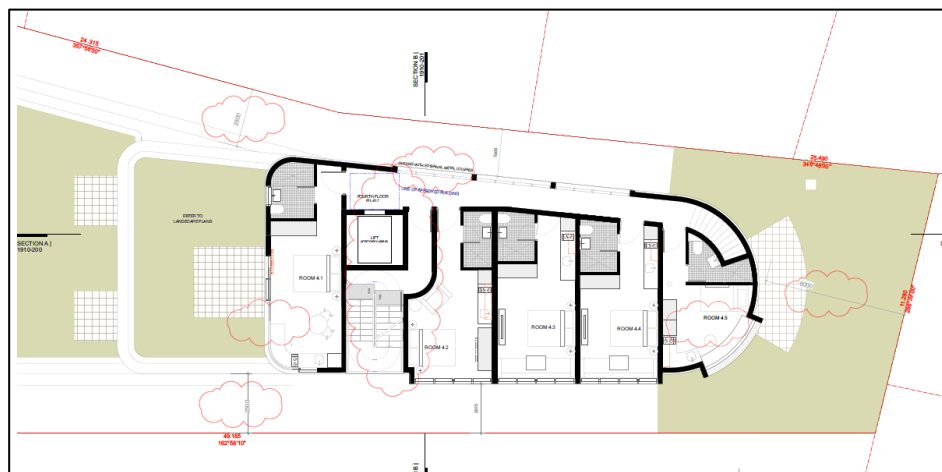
Approved fourth floor plan under DA/222/2020 (Source: SHED)
